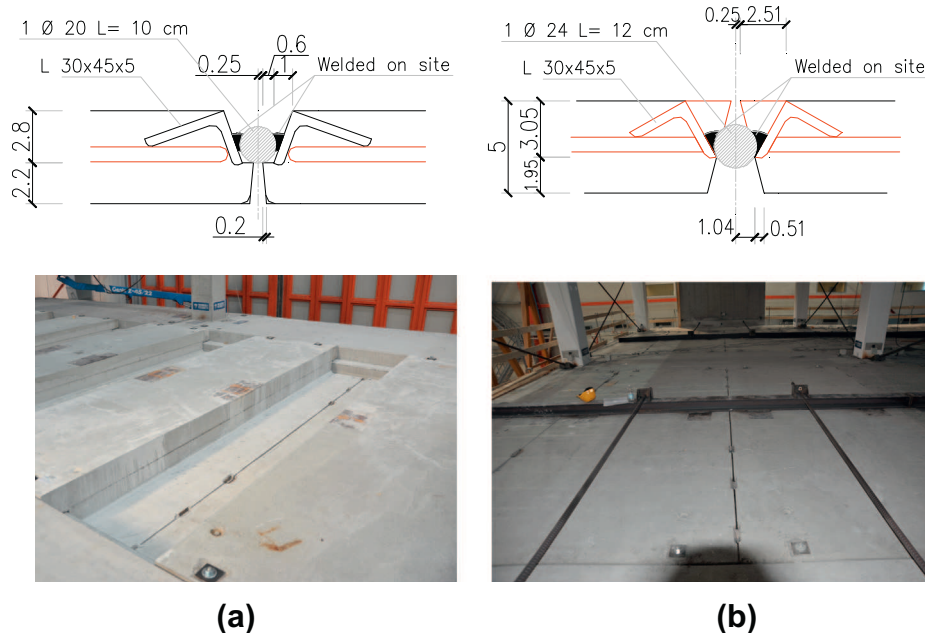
Slab-to-slab welded connections applied at the: (a) First and third floor. (b) Second floor.
